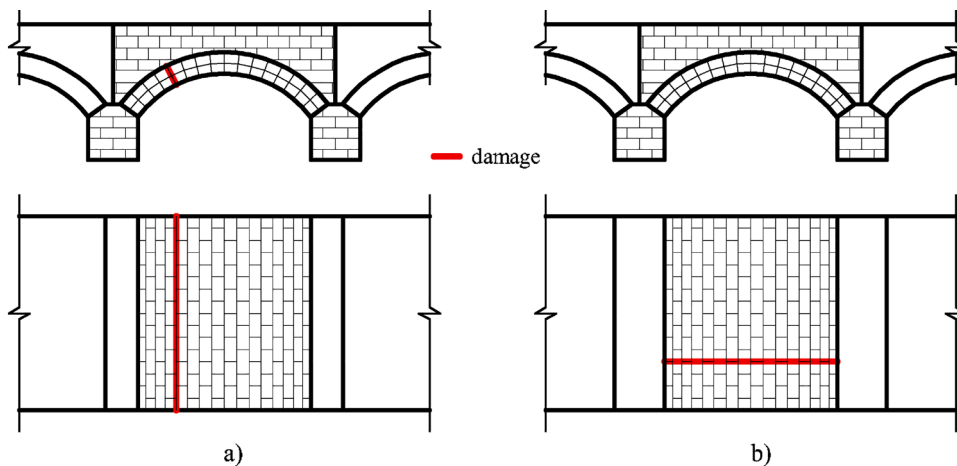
Damaged scenarios: a) transverse crack; b) longitudinal crack.
